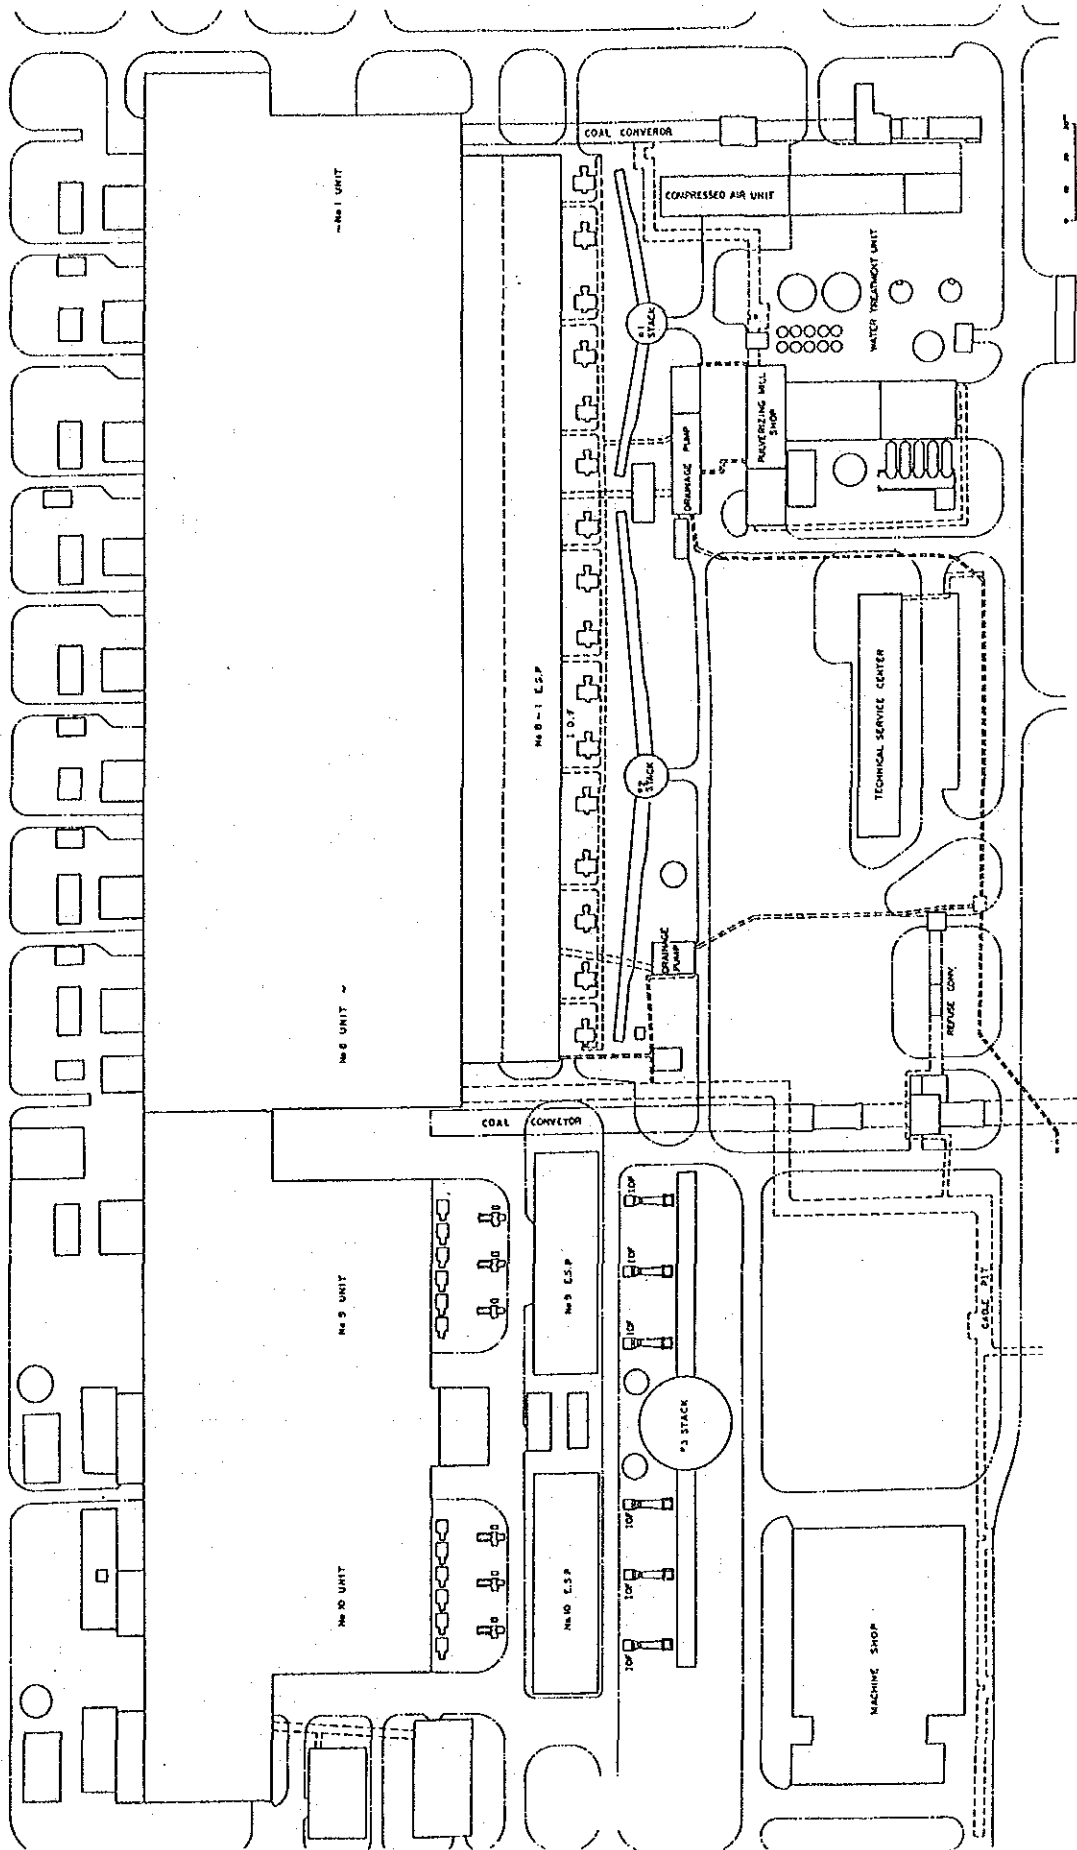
KOZIENICE POWER PLANT GENERAL LAYOUT
